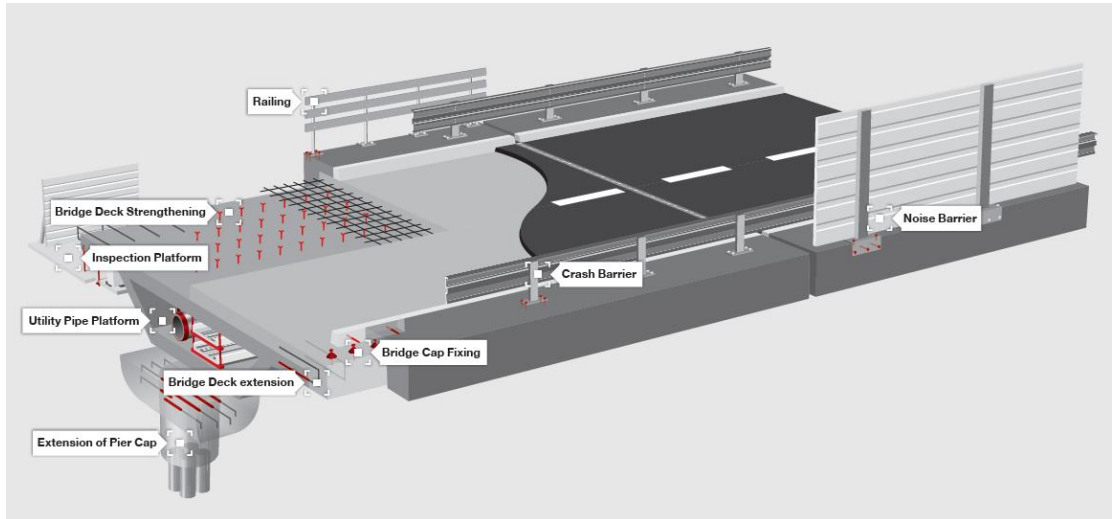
Illustrations of typical applications for jobsite bridges
